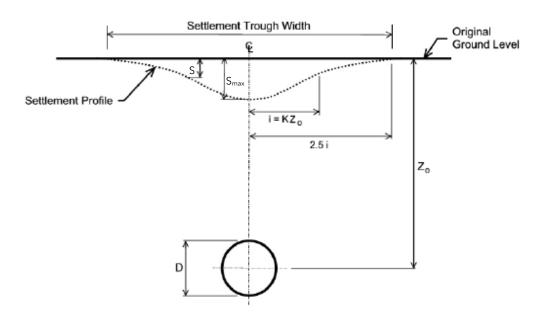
Typical Settlement Profile for a Soft Ground Tunnel (from Singapore LTA)
